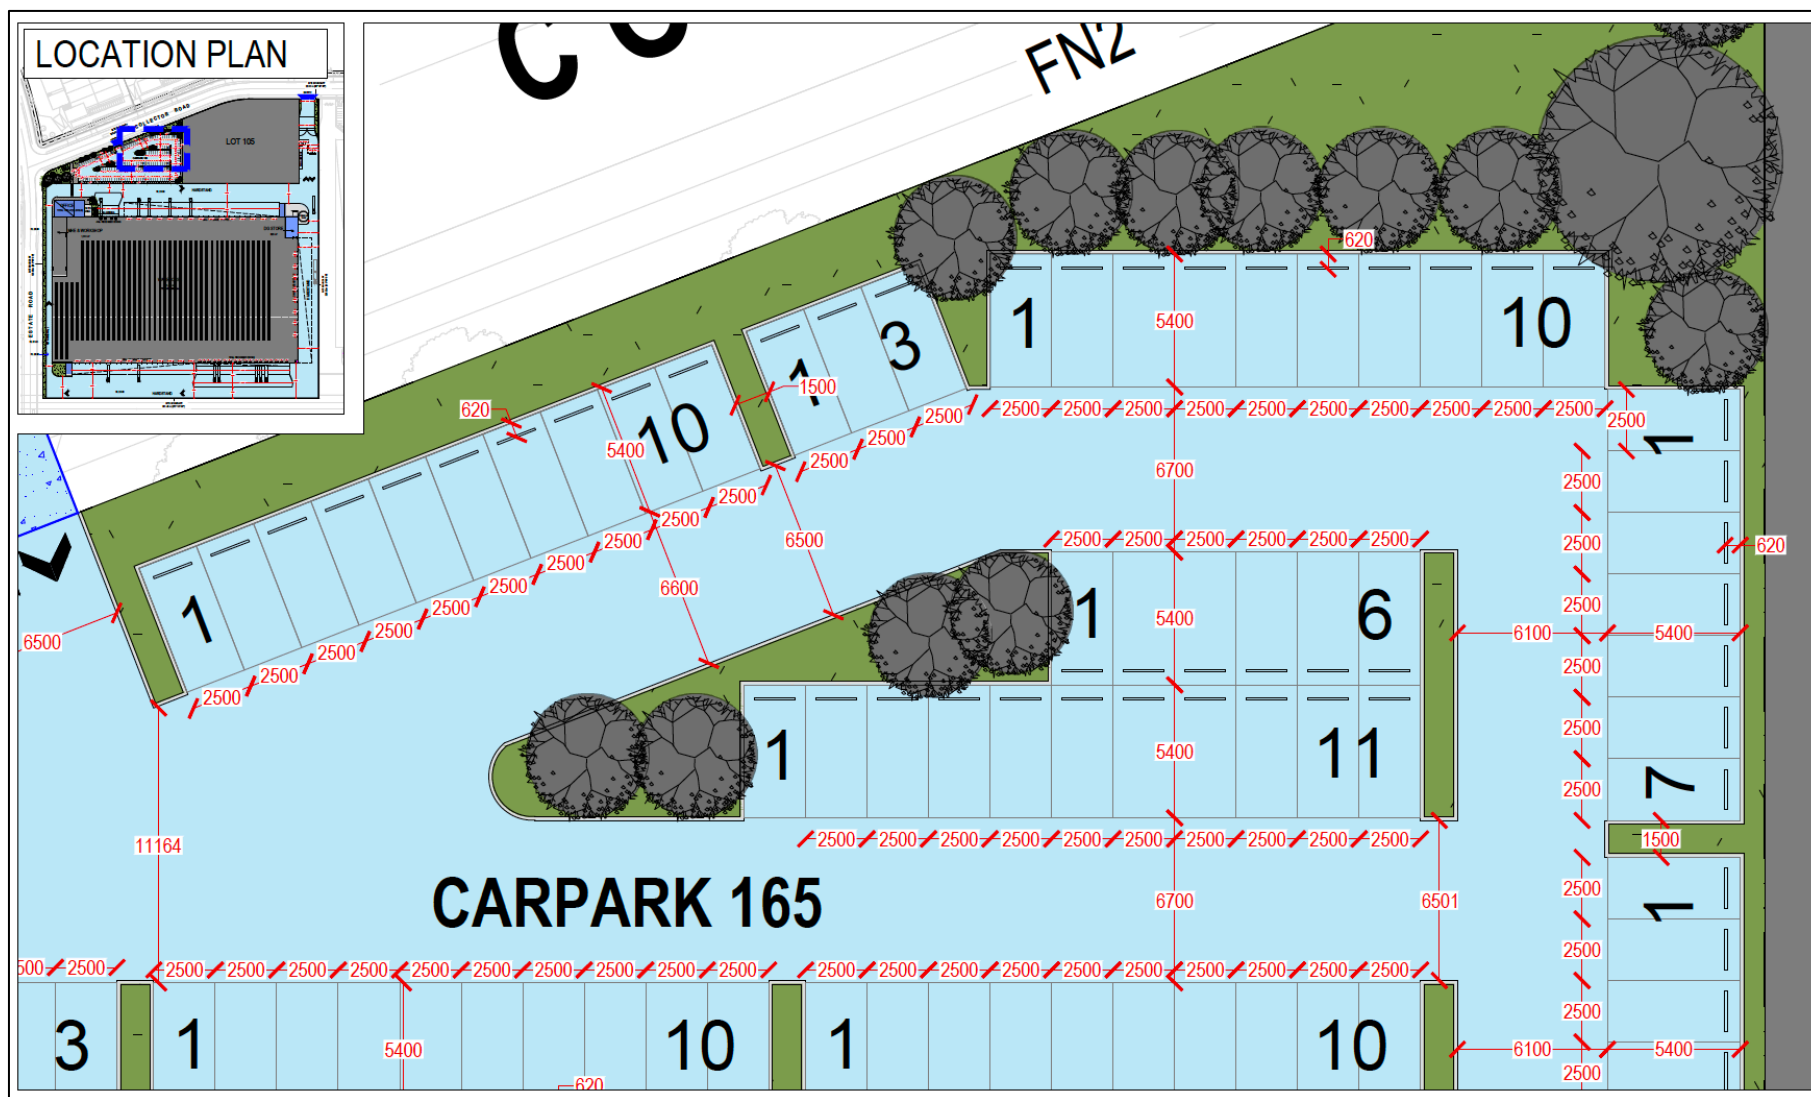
PROPOSED CAR PARKING LAYOUT AND DIMENSIONS
